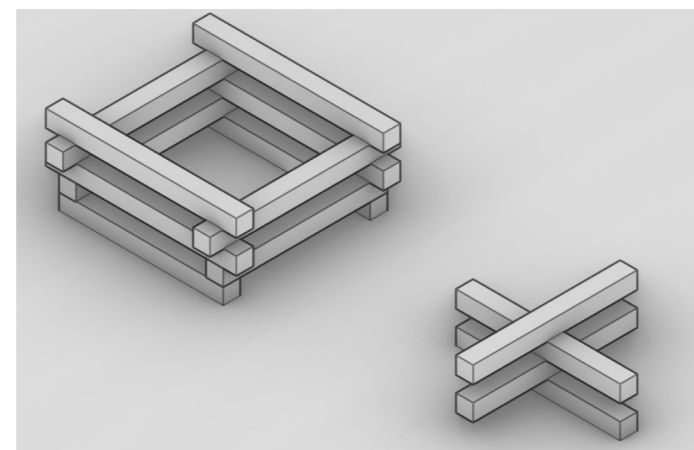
Two ways of stacking orthogonal beams horizontally (Own work, 2024)
